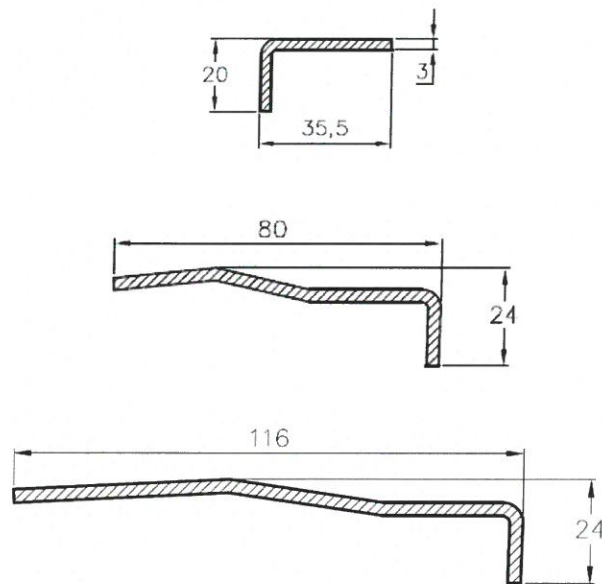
CONECTO PARK GA waterproof expansion joints profiles – aluminium
